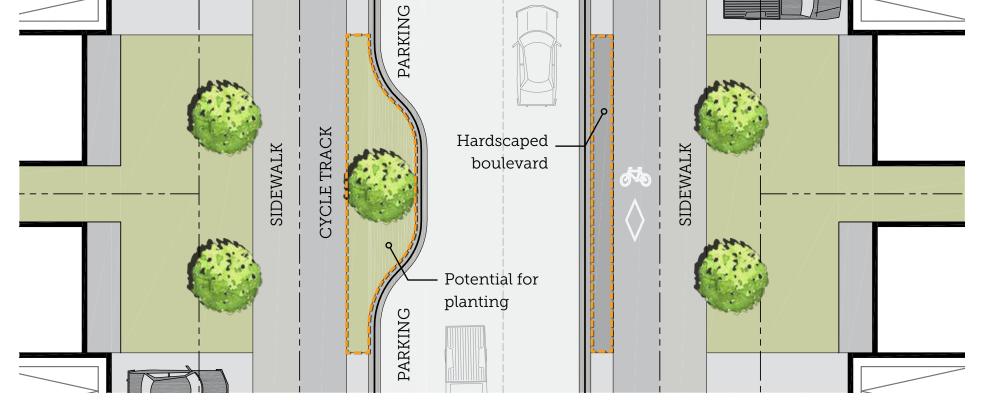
Collector Road Plan View with Periodic Bulb-Out
